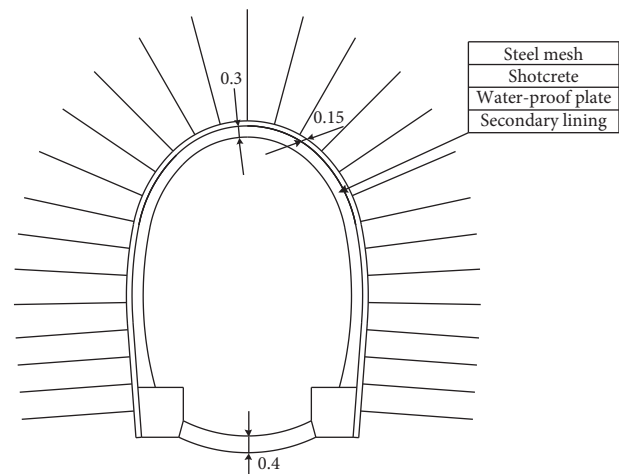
Typical supporting type of the tunnel (unit: m).
